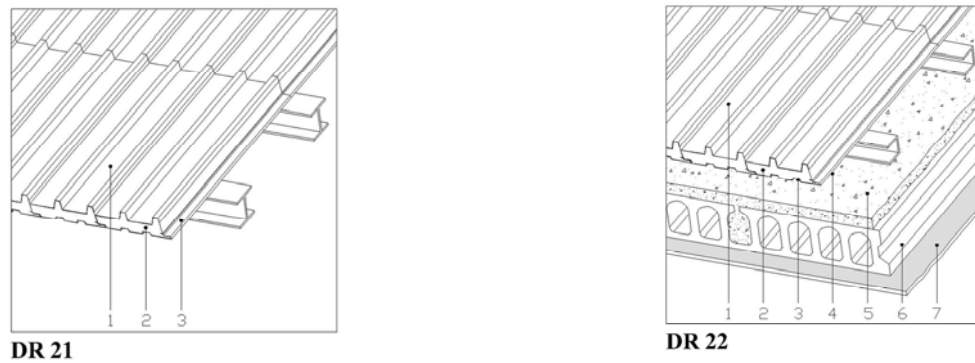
Technical solutions DR21 “Sandwich panel on discontinuous loadbearing structure“ and DR22 “Sandwich panel on prestressed concrete loadbearing structure“.
